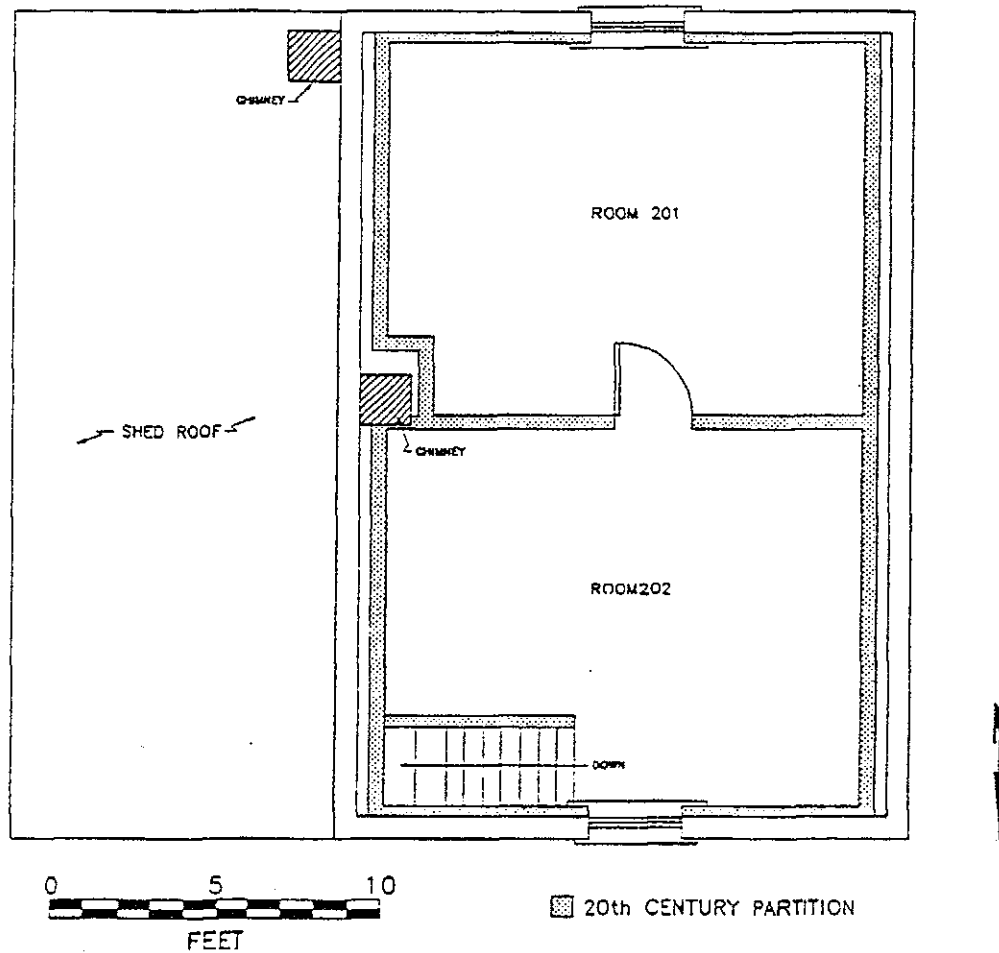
Second story floor plan of the Kiel House, 1994. Drawn by F. Mansberger.
